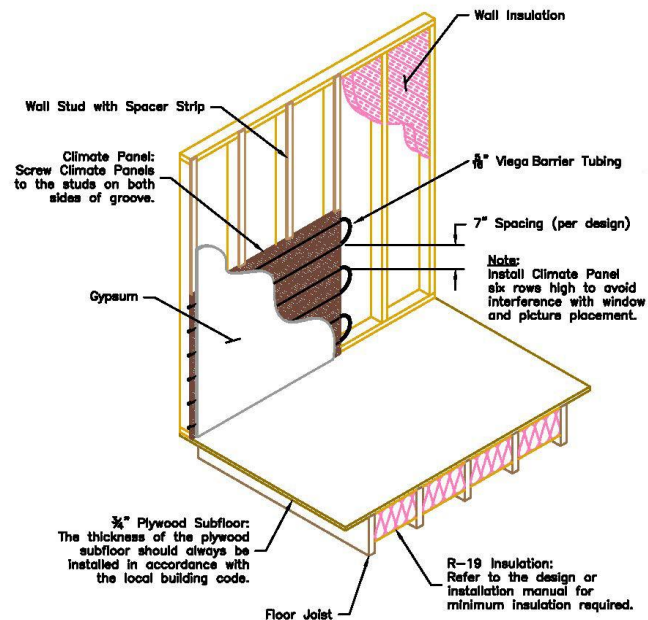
Climate Panel – Wall Gypsum - CP Wall Gypsum
